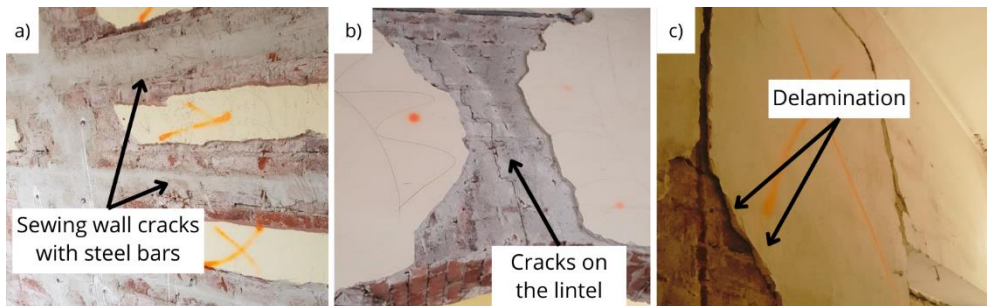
Examples of defects in plasters: a) caused by the repair of a crack in the wall, b) caused by structural cracks, c) delamination
